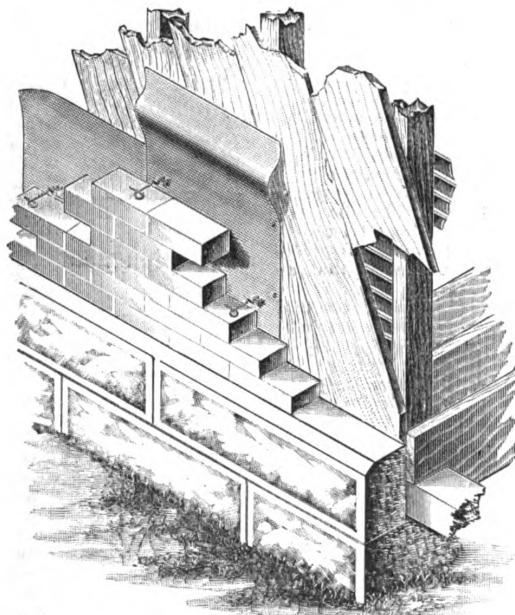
Half Timbered Building Bonded with Veneer Ties.
